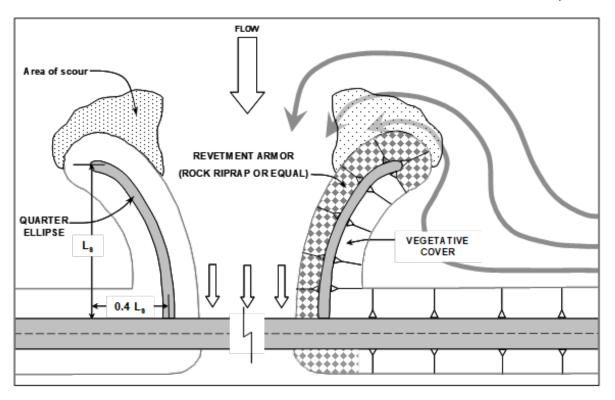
Typical guide bank (modified from FHWA 1978).
